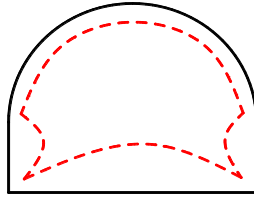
Deformation and Failure Modes of Surrounding Rock of the 1101 Roadway
